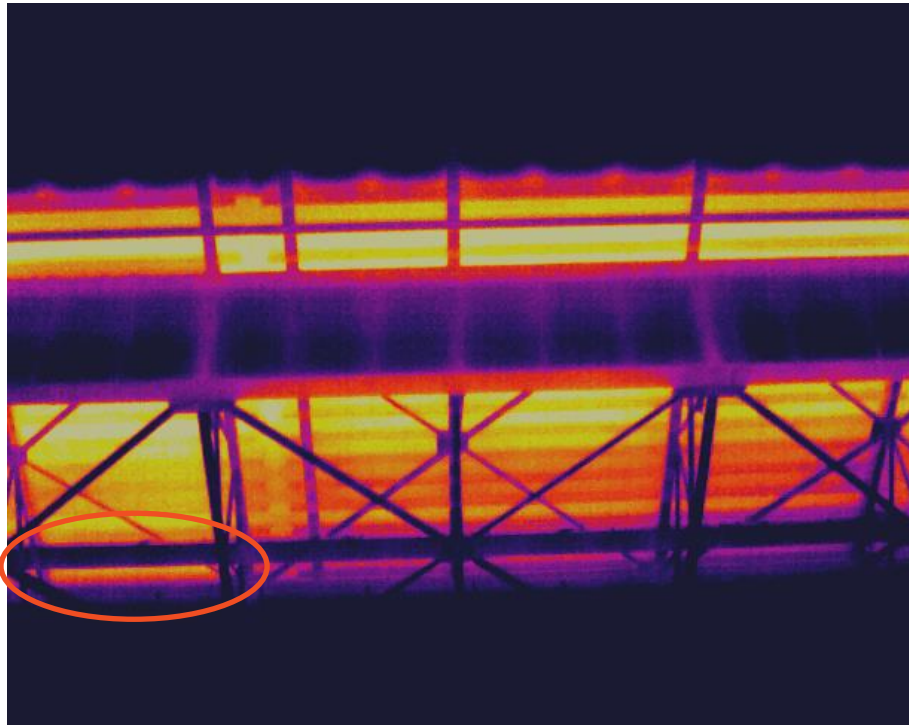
Slightly Brighter (Warmer) Trough Between First and Second Floorbeam North of Bent 5.
